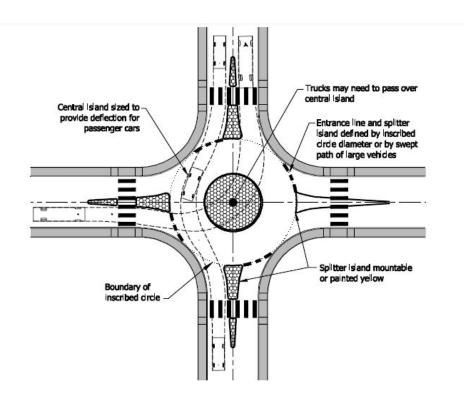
MINI-ROUNDABOUT DESIGN ELEMENTS^{*}
